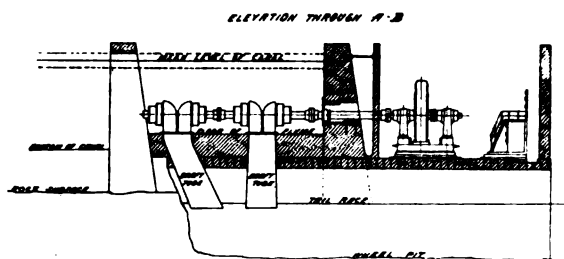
THE MASSENA ELECTRIC GENERATING PLANT.—ELEVATION THROUGH A-B.
